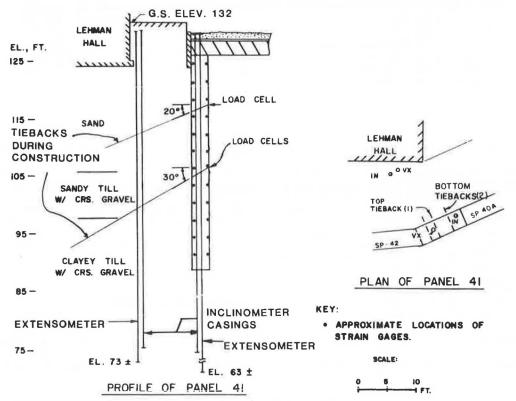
Typical instrumented section, plan and profile (Panel 41).
